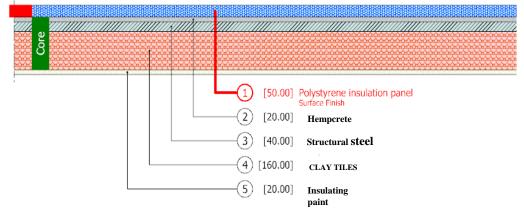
Pitched roof top composed of insulated hollow-core slabs section.
